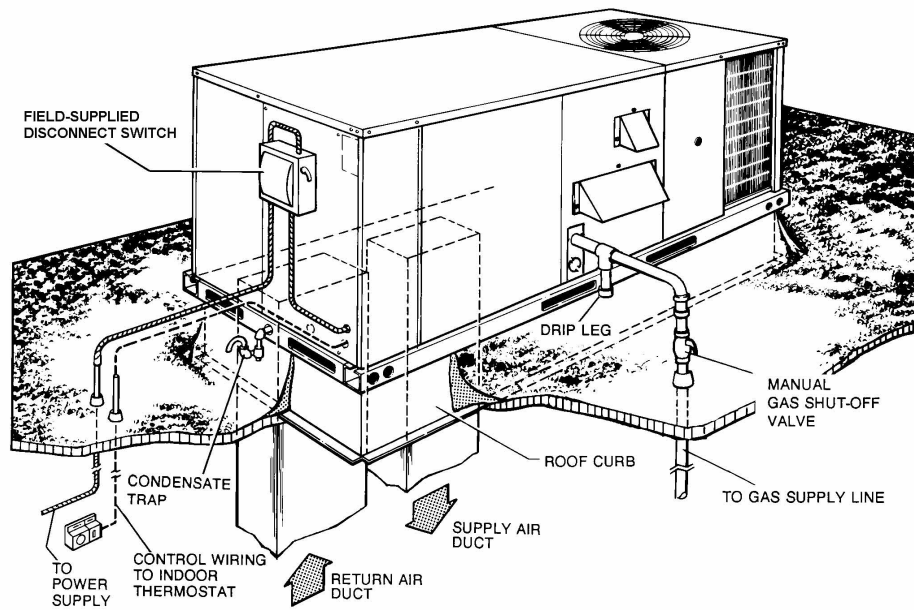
TYPICAL ROOF TOP INSTALLATION
